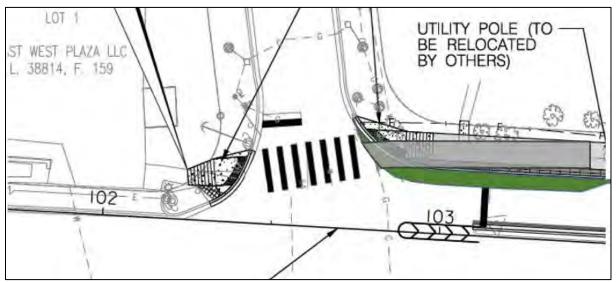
New Ave Bikeway at Auburn Avenue – Proposed Modifications
